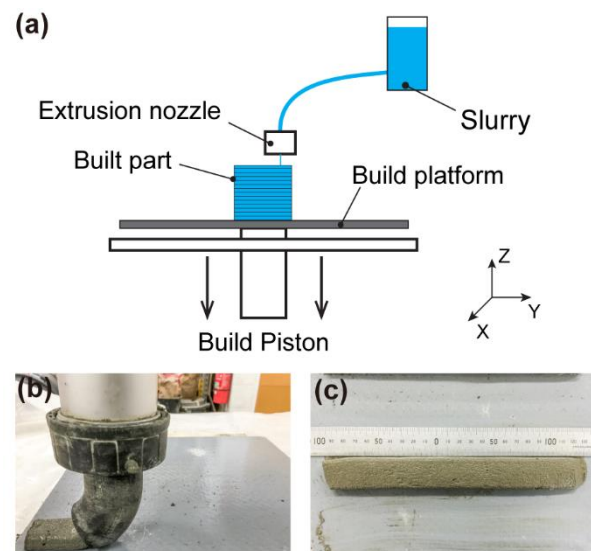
(a) Schematic illustration of the extrusion-based 3D printing process, (b) 45° angle extrusion nozzle, (c) One layer of extruded concrete (250 mm (L) \times 25 mm (W) \times 15 mm (H))
